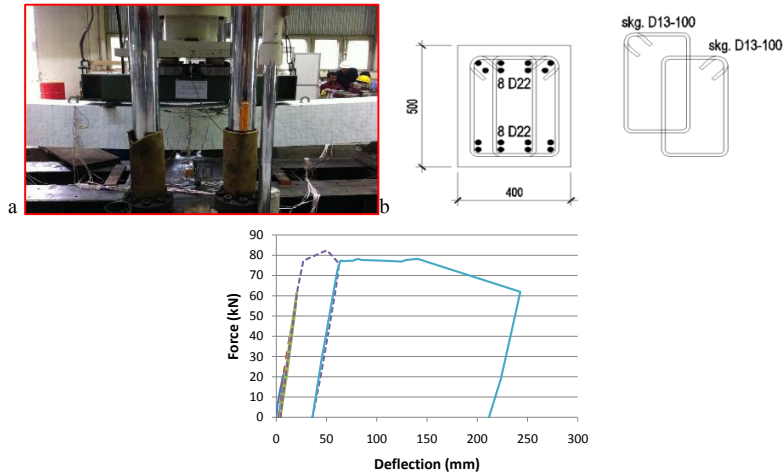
Test result of reinforced concrete beam specimen 10(a) specimen, 10(b) reinforcement, 10(c) Load-deflection curve
